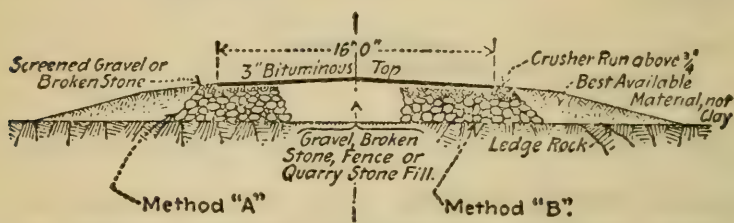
Special foundation where road is subjected to flood water ponding in spring of year.
